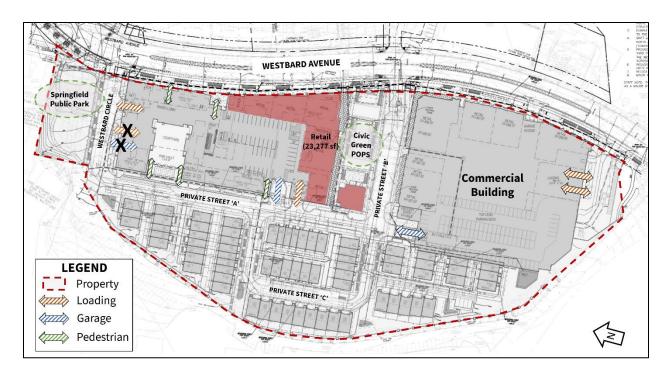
Circulation Exhibit for Site Plan No. 82018019A
